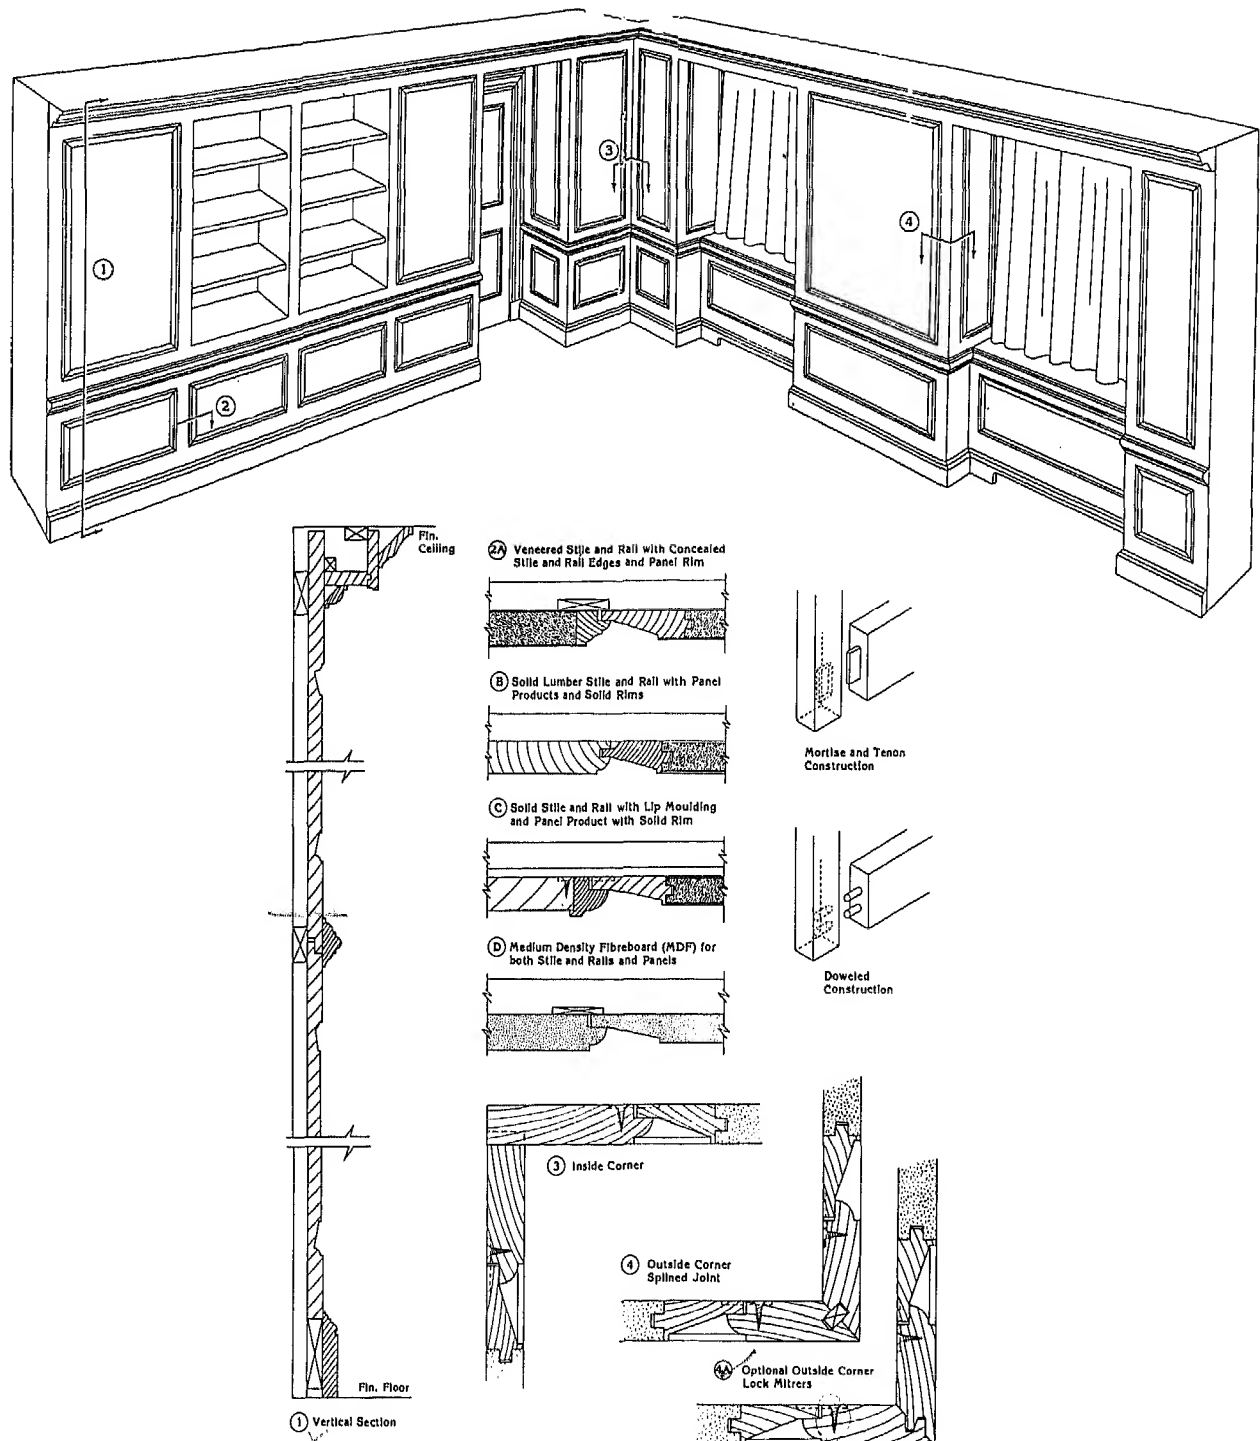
Full-height stile and rail raised paneling. Stile and rail wall paneling accented by raised panels creates a beautiful effect of traditional architectural woodwork. Framed within the stiles and rails and accented by the shadow lines, this construction offers limitless opportunities for various effects through the use of different wood species and veneer cuts. Each design creates a unique atmosphere complimented by the finely proportioned paneling.
